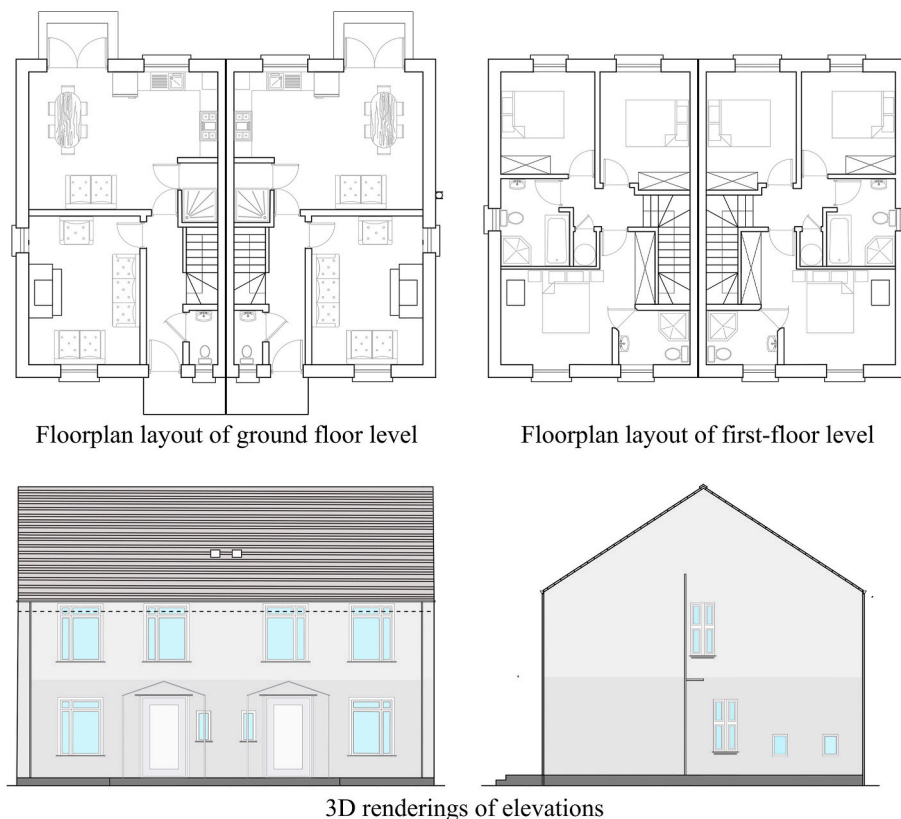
Design plans and 3D renderings of the elevations for the reference case study.
